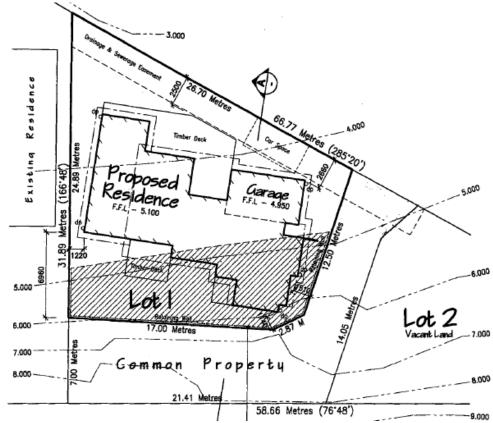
Endorsed Layout Plan (Lot 1) pursuant to permit 23/2013/P
